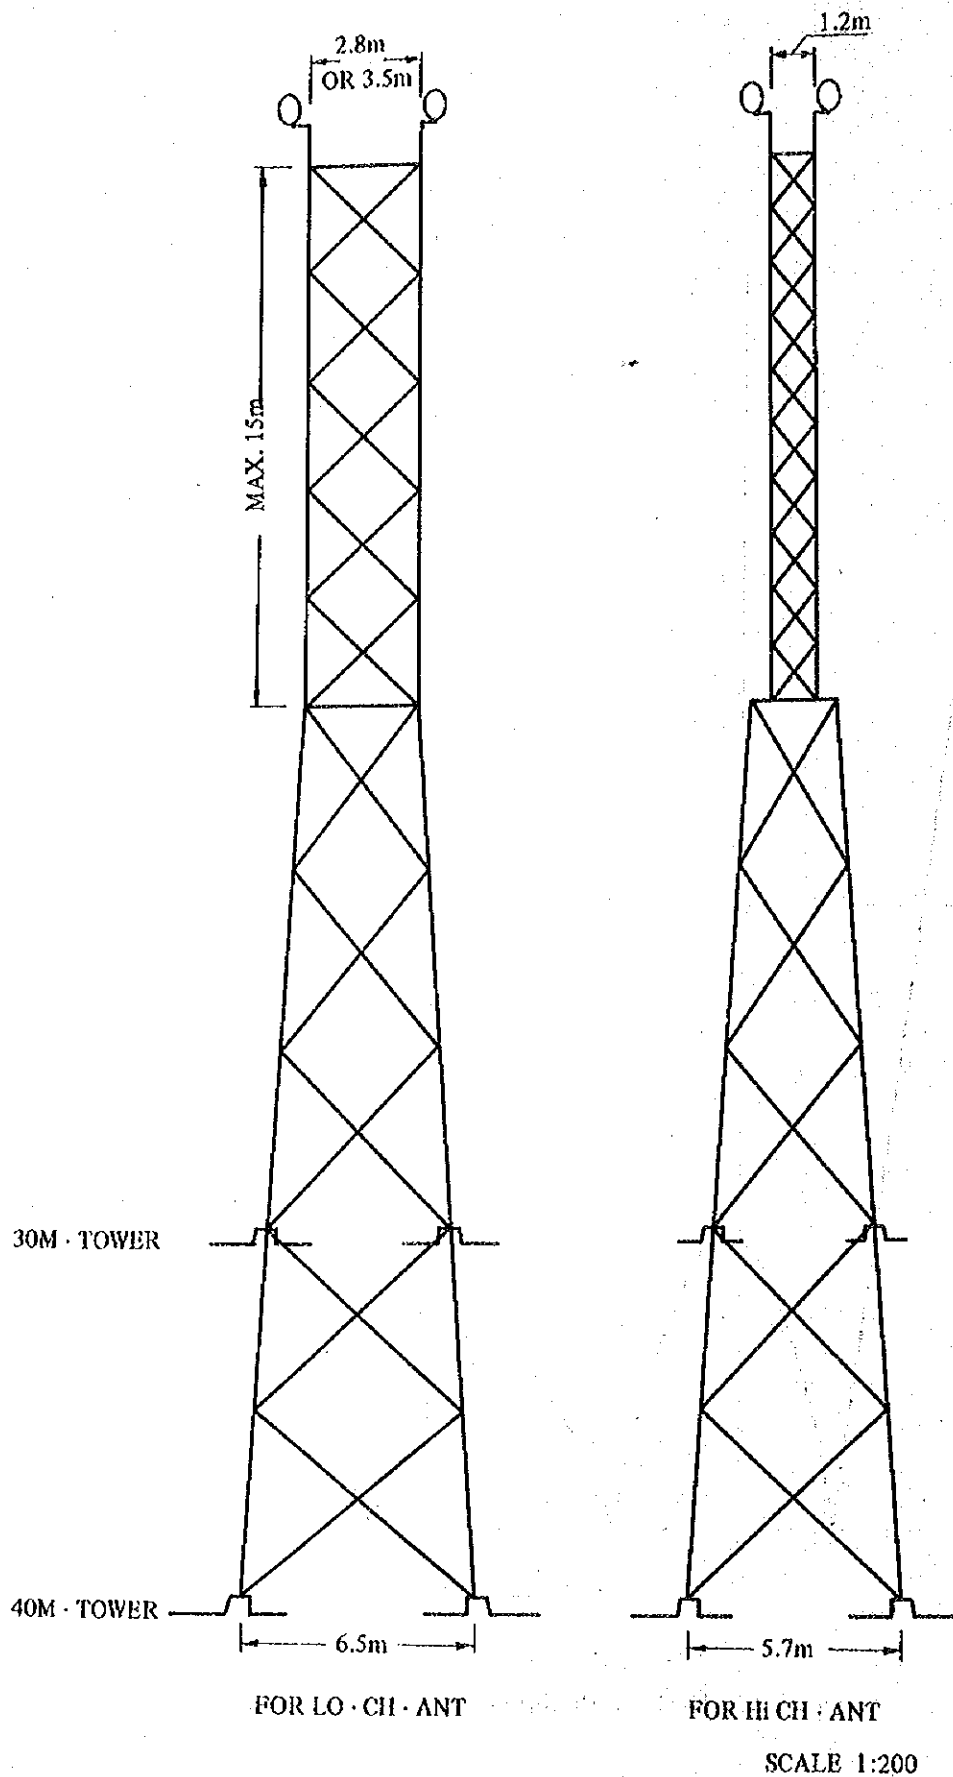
Plan of Self-Supported Tower (Less than 40m Height)
